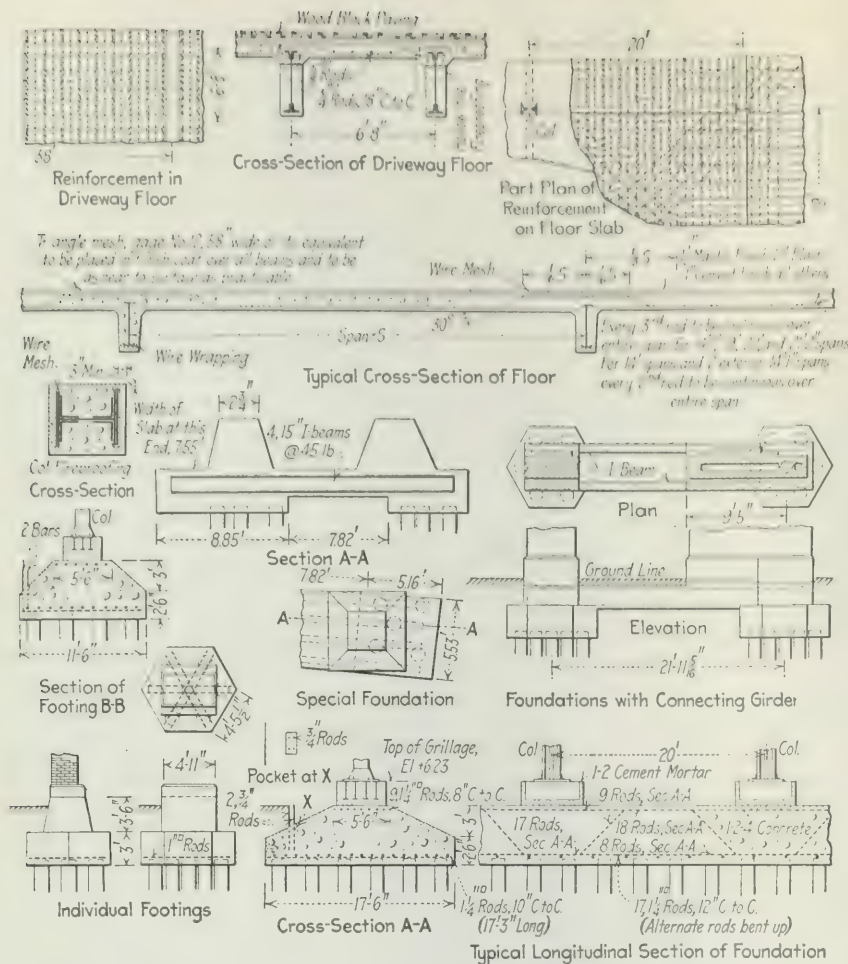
DETAILS OF FOUNDATIONS AND FLOORS OF FREIGHT TERMINAL
